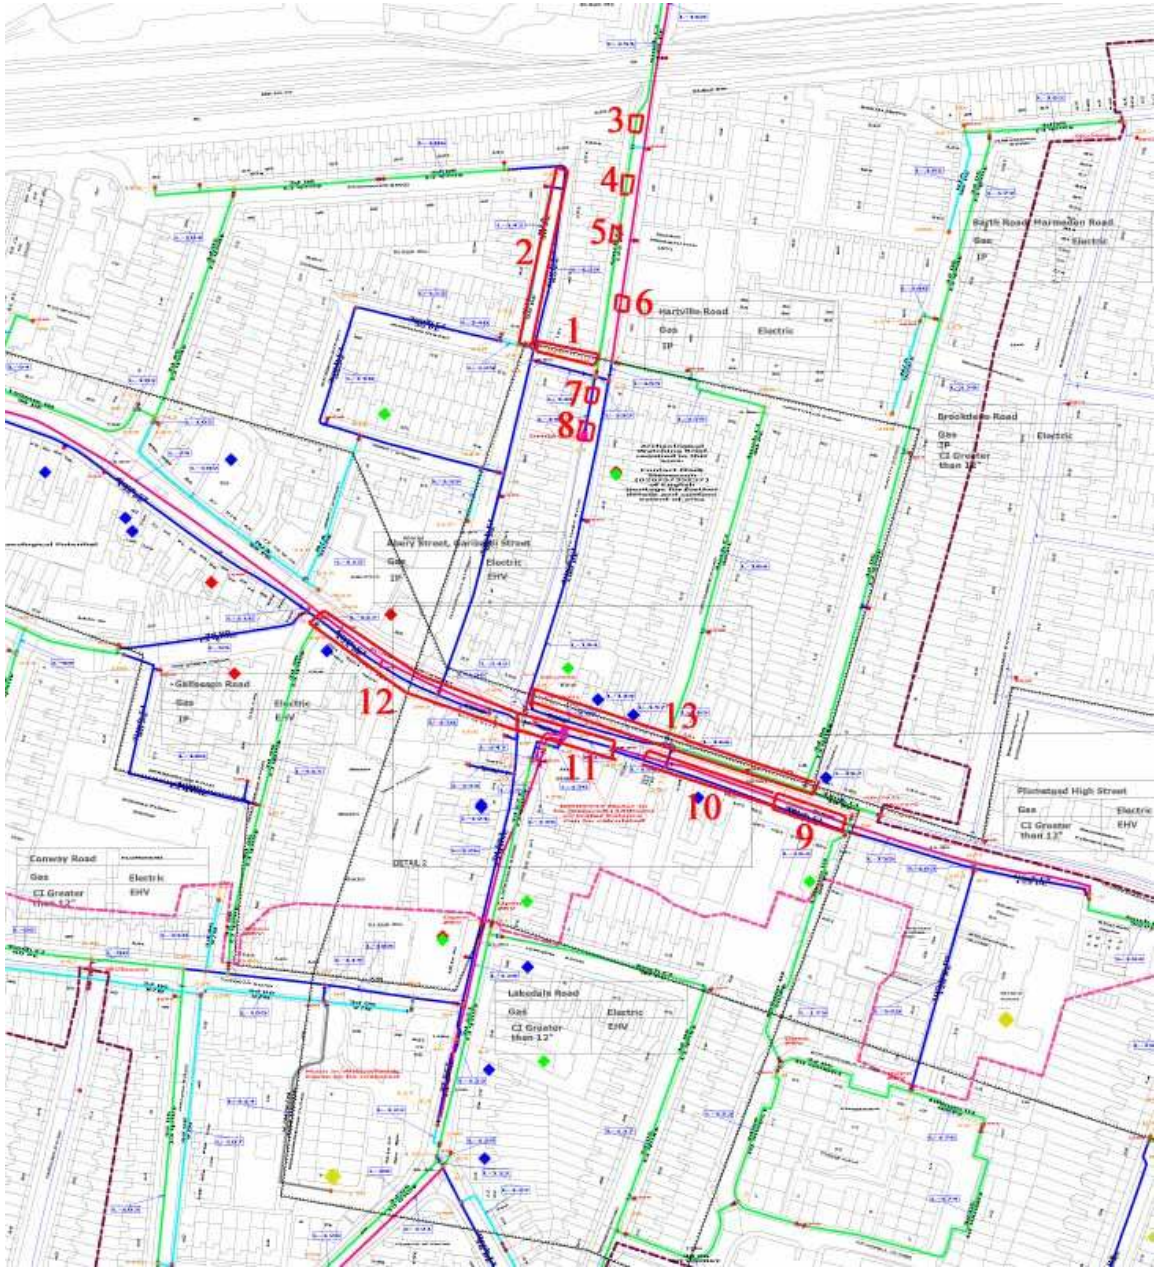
Plan of the area around Plumstead High Street (running across the centre of the frame), with trenches / pits monitored marked.
